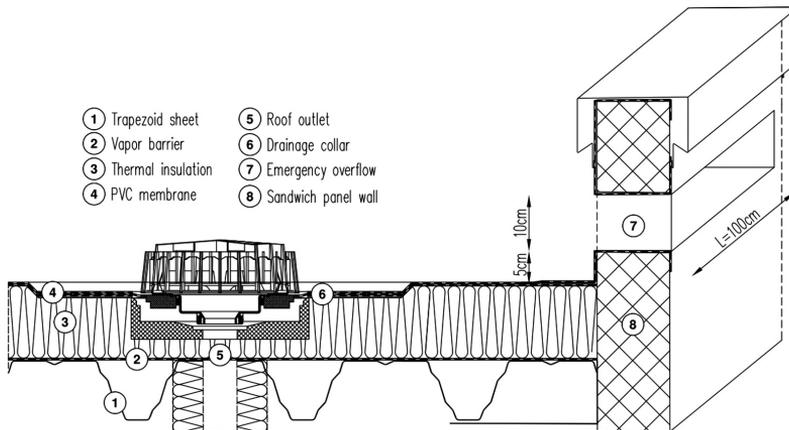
Geometry of a typical syphonic roof outlet and attic emergency overflow
